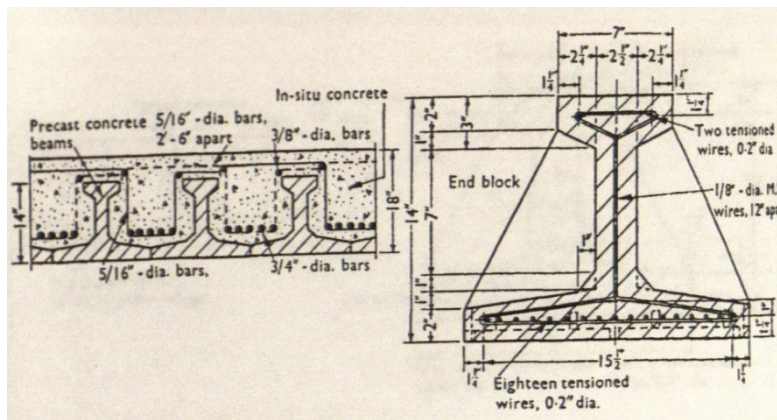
Composite partially prestressed bridge deck with non-prestressed reinforcement (Bennett 1984)
